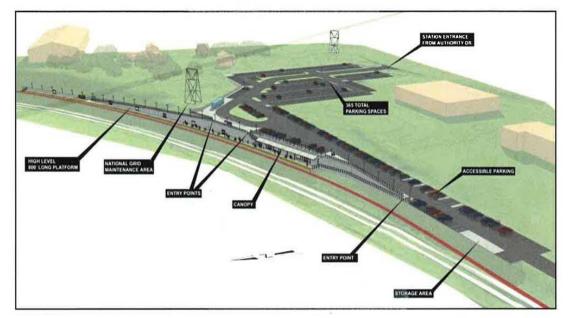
Proposed Layout of Wachusett Station & Parking Lot – Fitchburg
